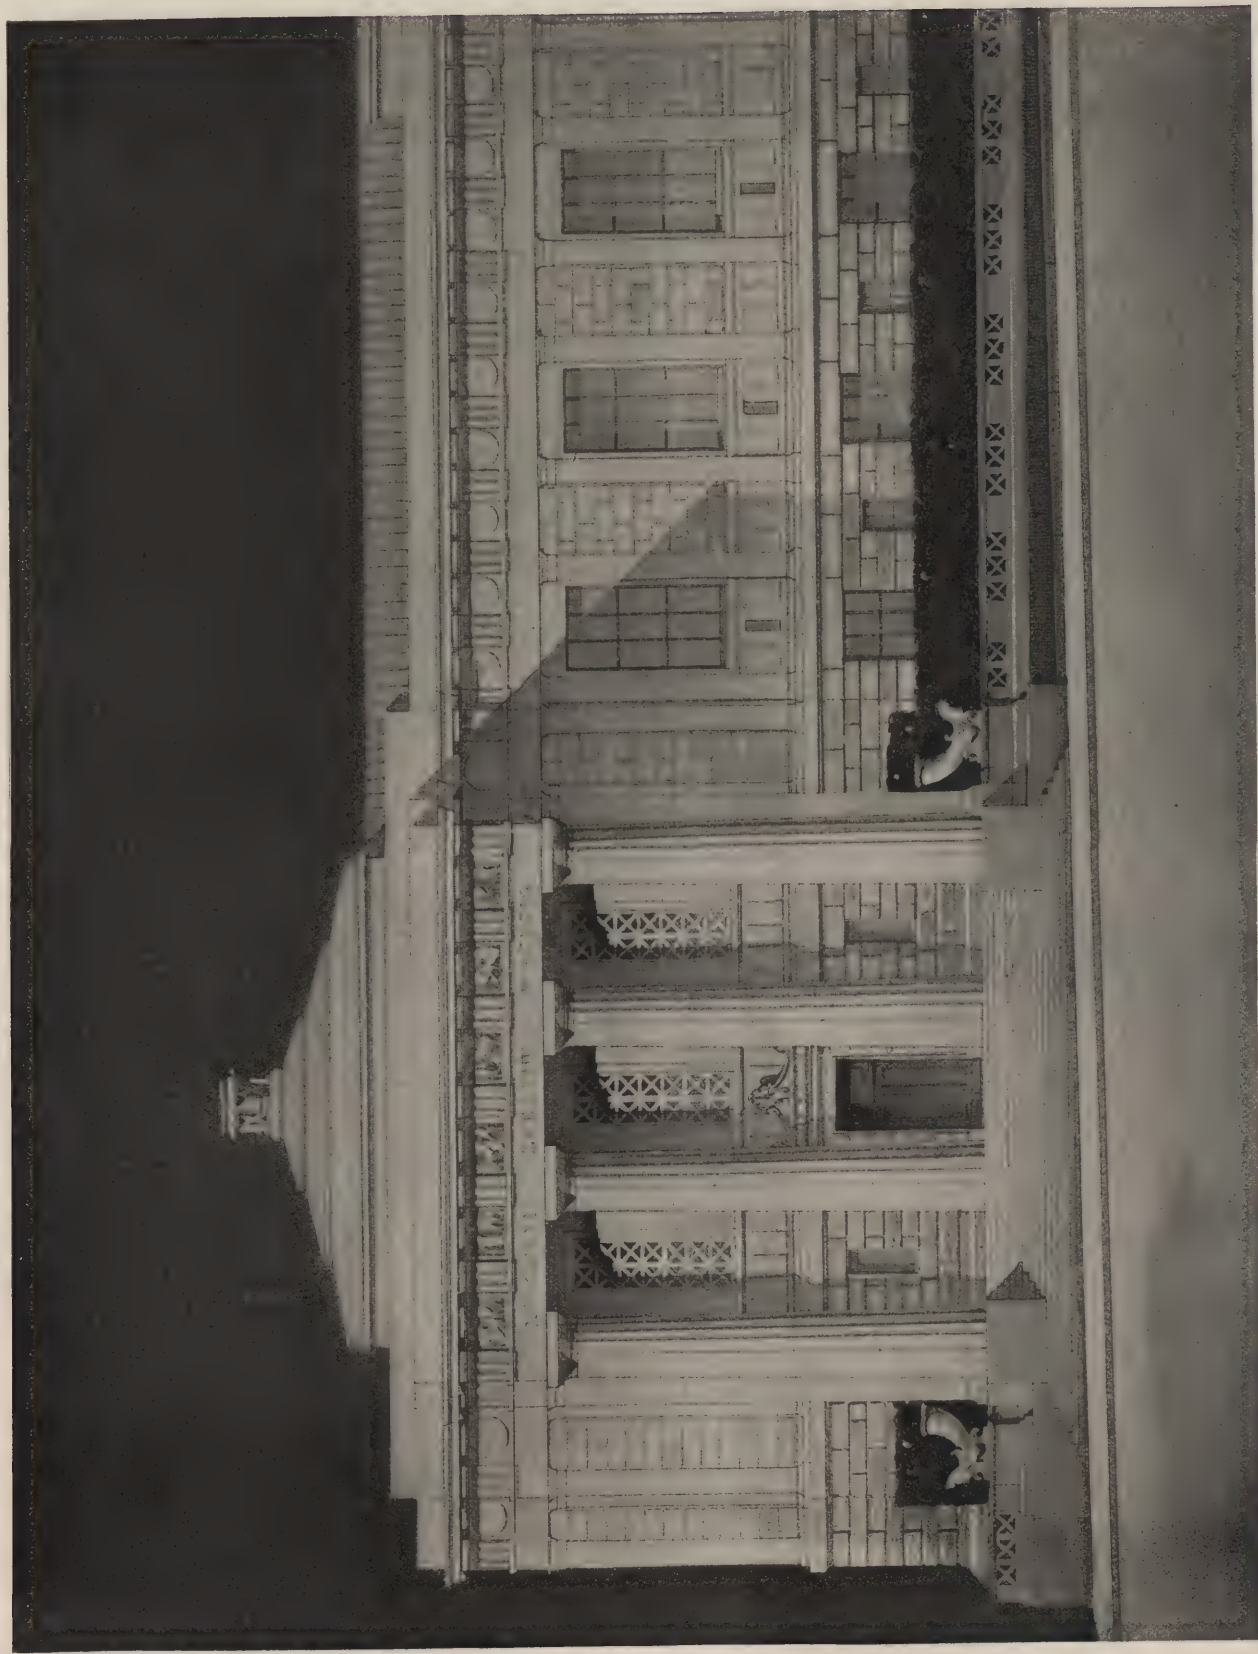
Competition Design for New Castle County-Wilmington Public Buildings. Tracy & Swartwout, Architects.
